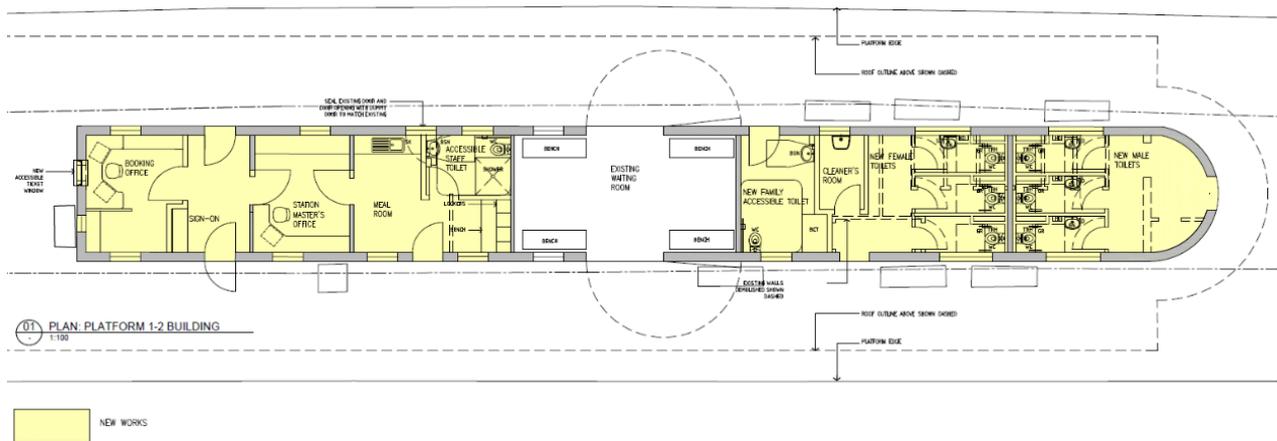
Layout plan of Platform 1 and 2 Building. (Transport for NSW, Wentworthville Building Plan Option 2.1, Drawing No. SKA008).
